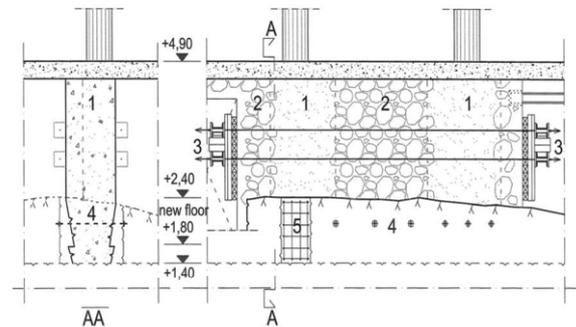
Pretensioned wall during work: 1-Old concrete pilaster 2-Bolder fill 3-Pretensioning device 4- Tensile rods in rock 5- New column section.
